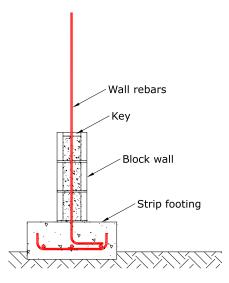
STRIP FOOTING REINFORCEMENT
